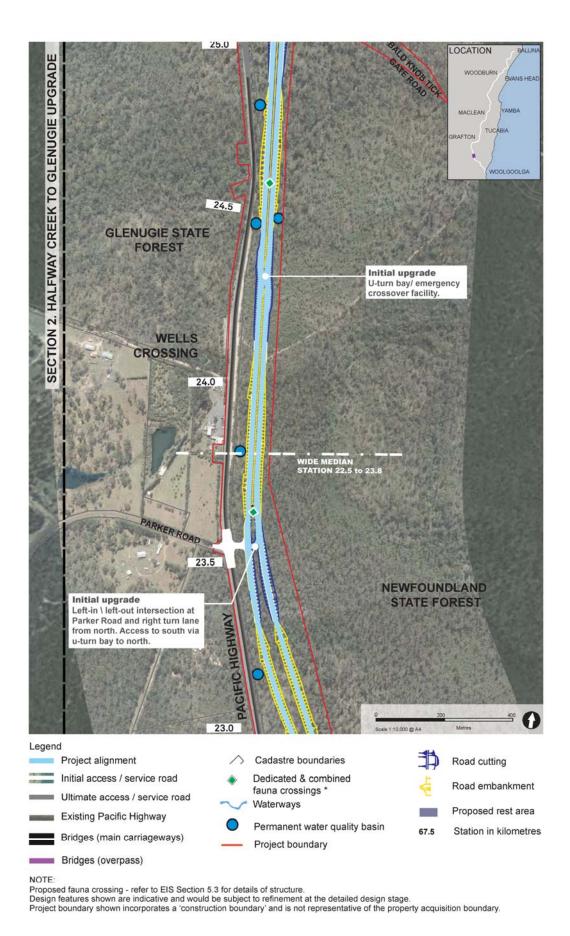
The project - Section 2 (Station 23.0 to 25.0)
